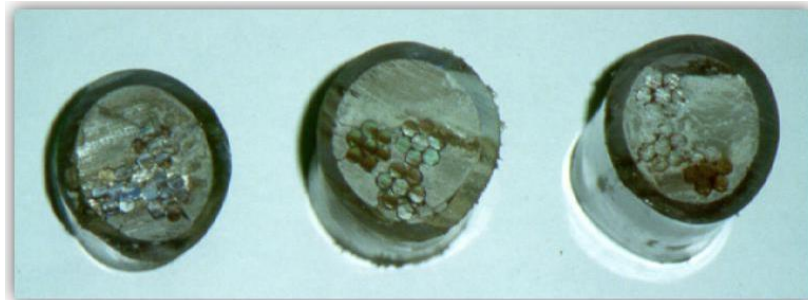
Final arrangement of steel strands inside duct after post-tensioning.
